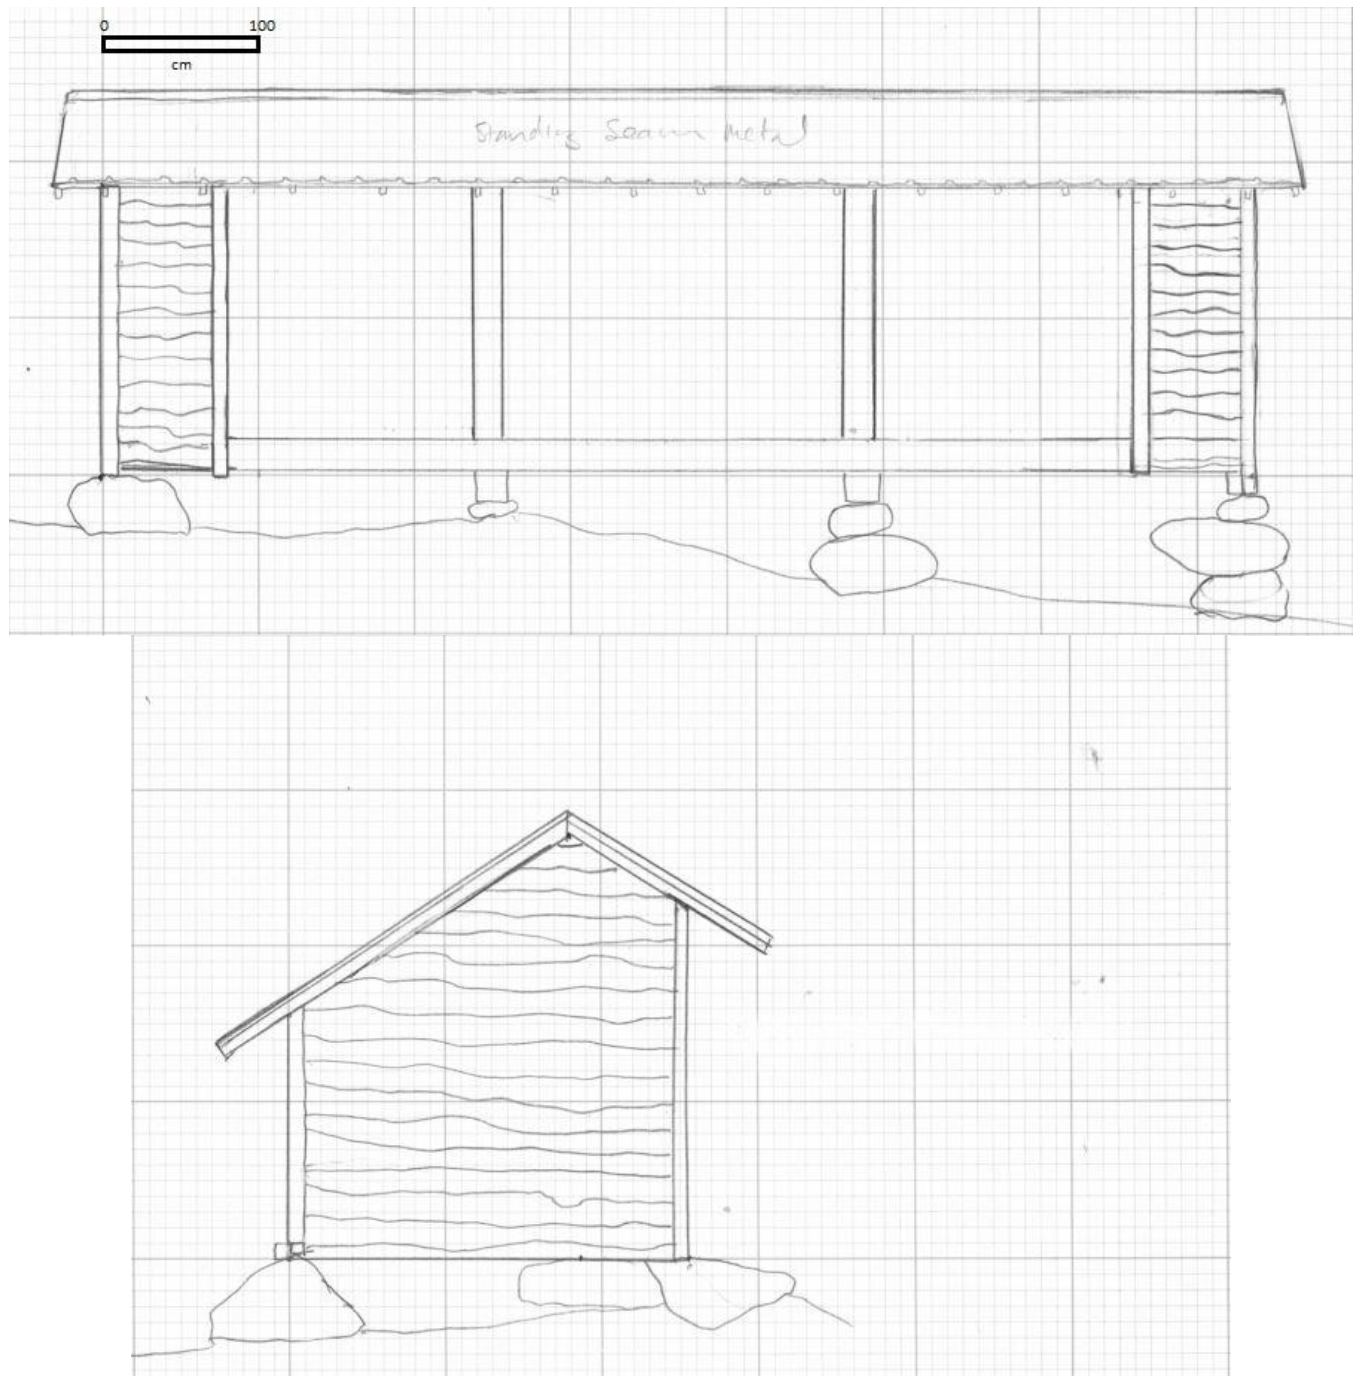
Hermit Lake No. 2 shelter. August 7, 2011. Above: Southeast (front) elevation. Below: Southwest side elevation.
